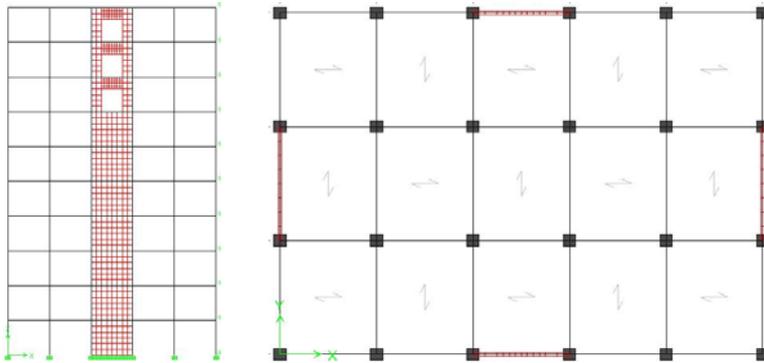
Plan and elevation of numerical model of 10 story reinforced concrete building
